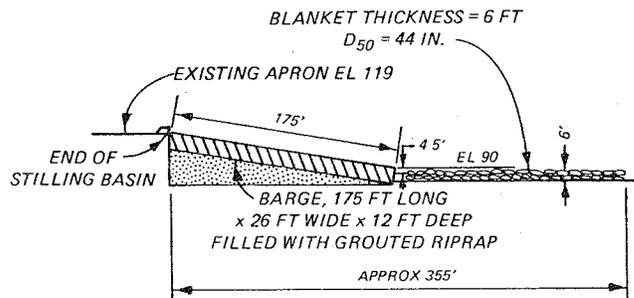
Scour protection plan for Dam No. 2, Arkansas River
